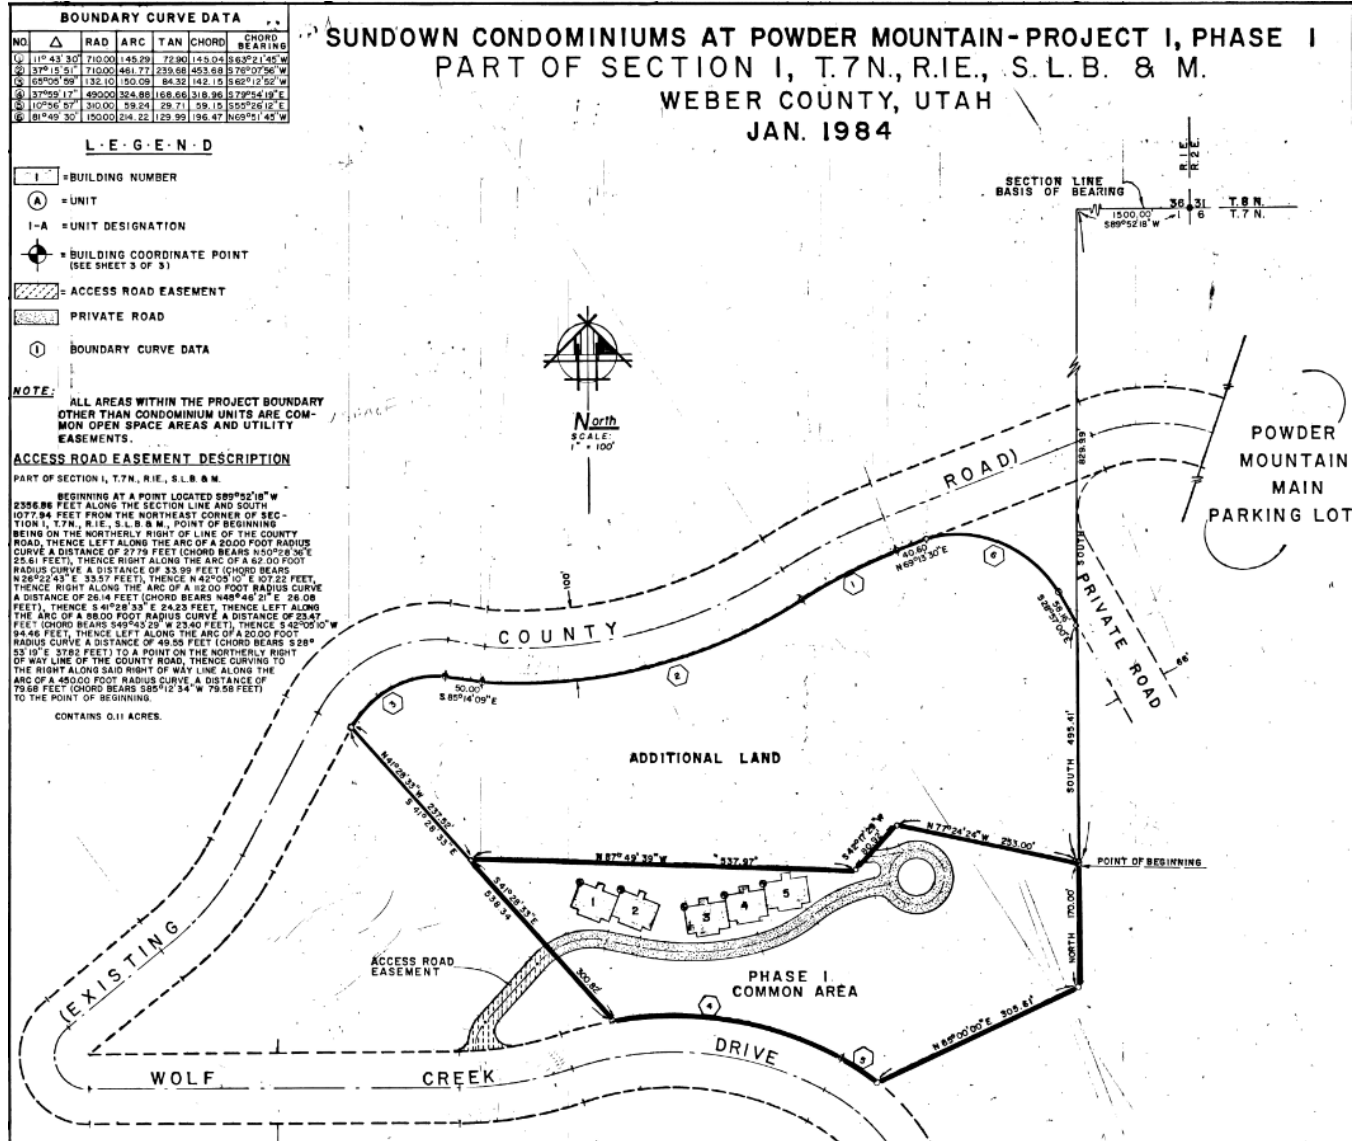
Exhibit C- Proposed Plat, and Changes from Original Site Plan
